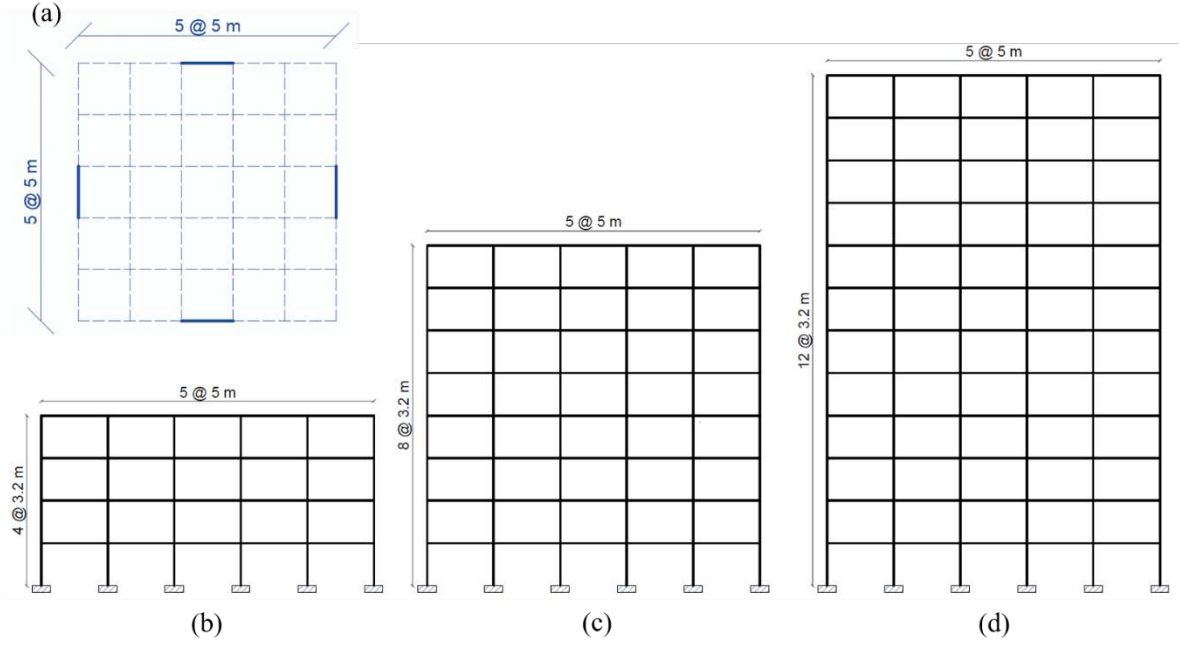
(a) Schematic plan view of models, and elevation view of (b) 4-story building, (c) 8-story building, and (d) 12-story building
